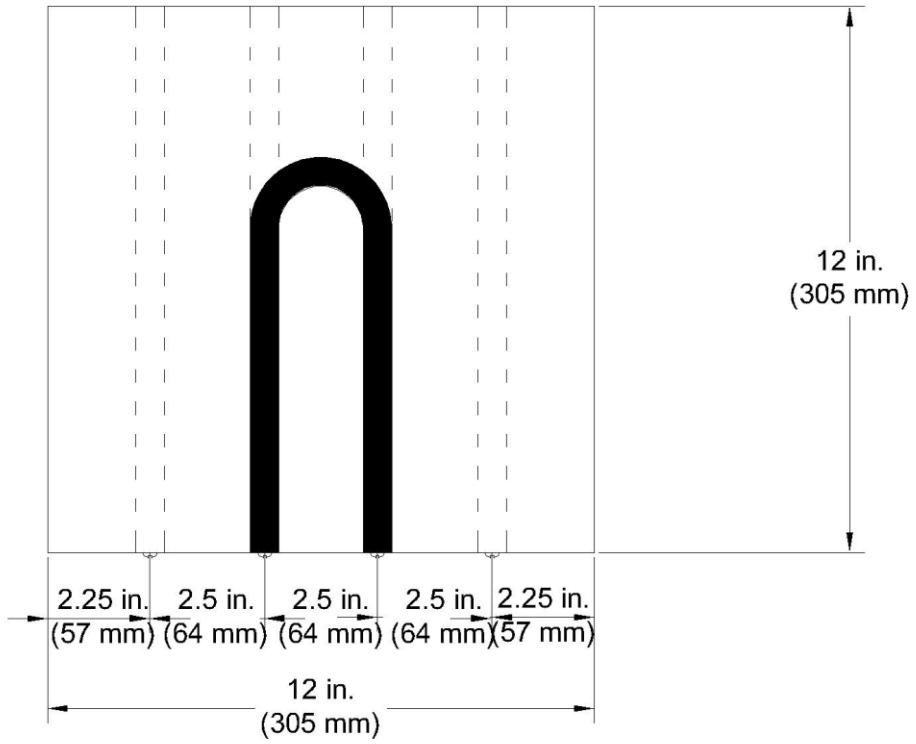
Plan view of Southern Exposure specimen with a bent anode bar.
